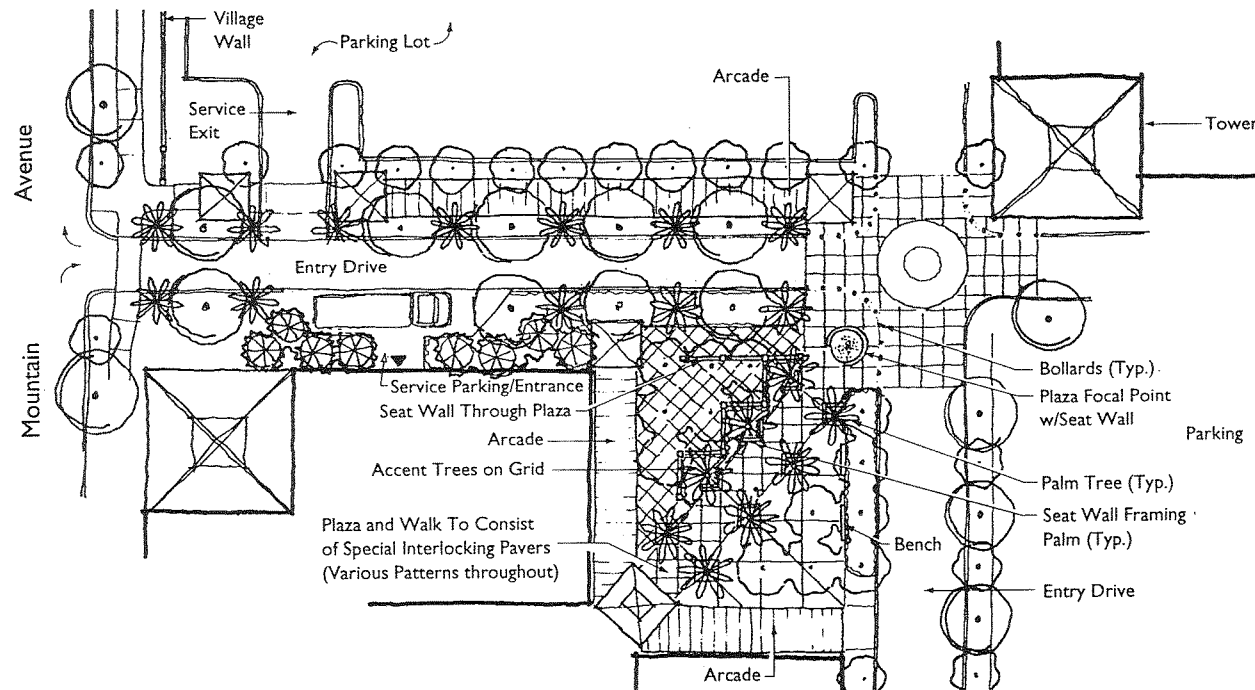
, Sixth Street Plaza located east of Mountain Avenue. This plaza will largely mirror the Cinema Plaza with a diagonal row of palms, an arcade and outdoor eating area.
